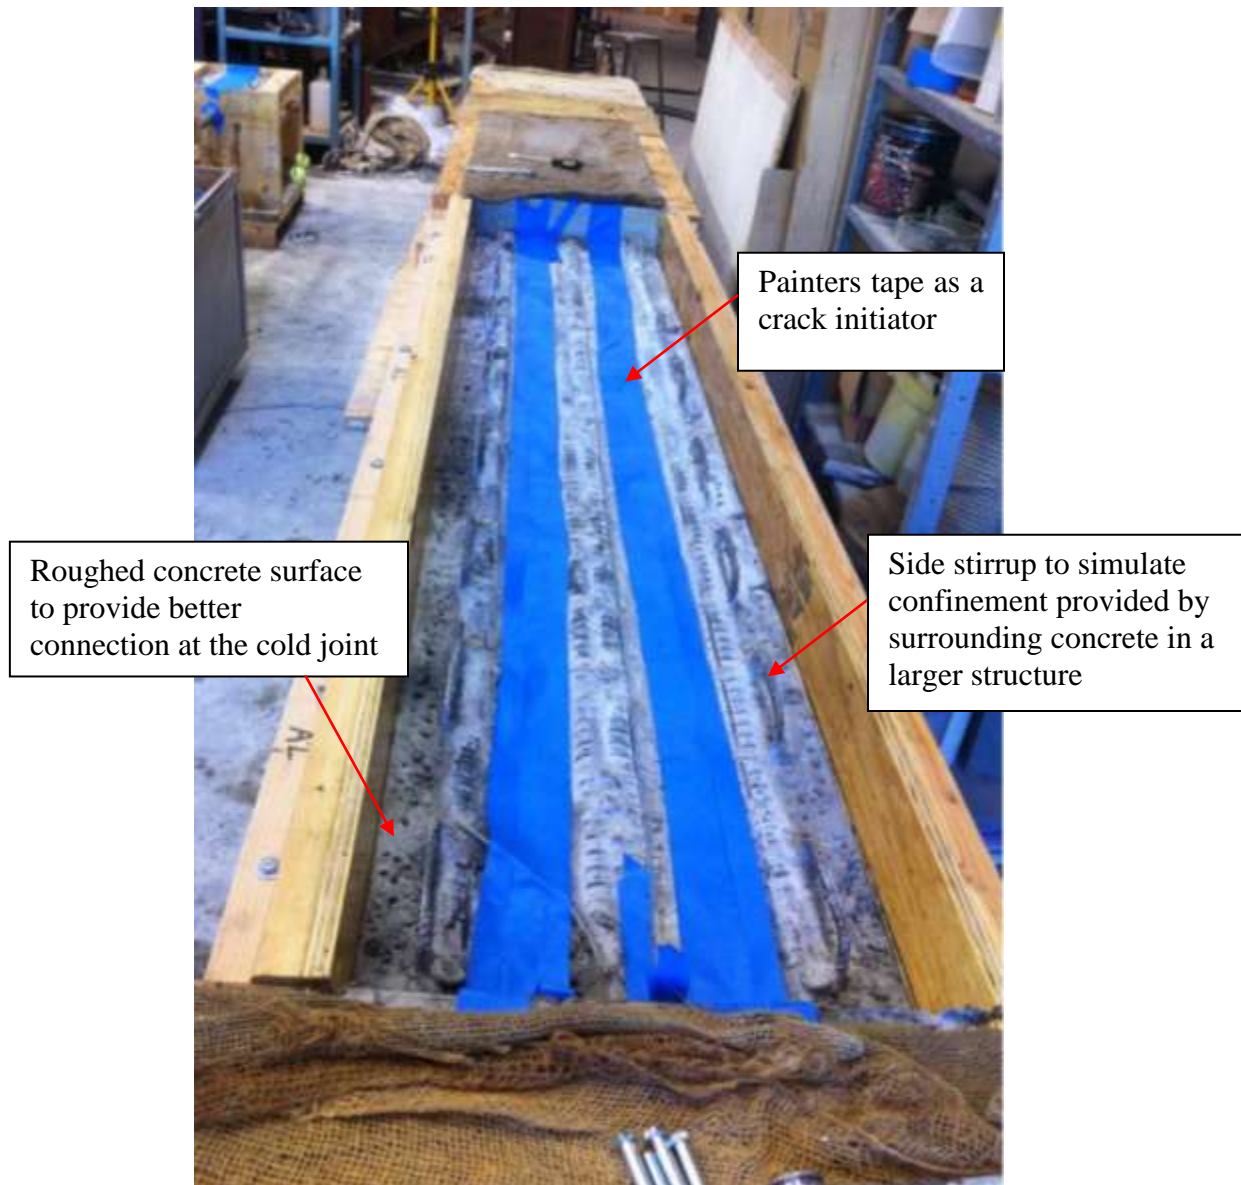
Painters tape placed to simulate a preexisting crack at the plane of the reinforcement in Beam A2.
